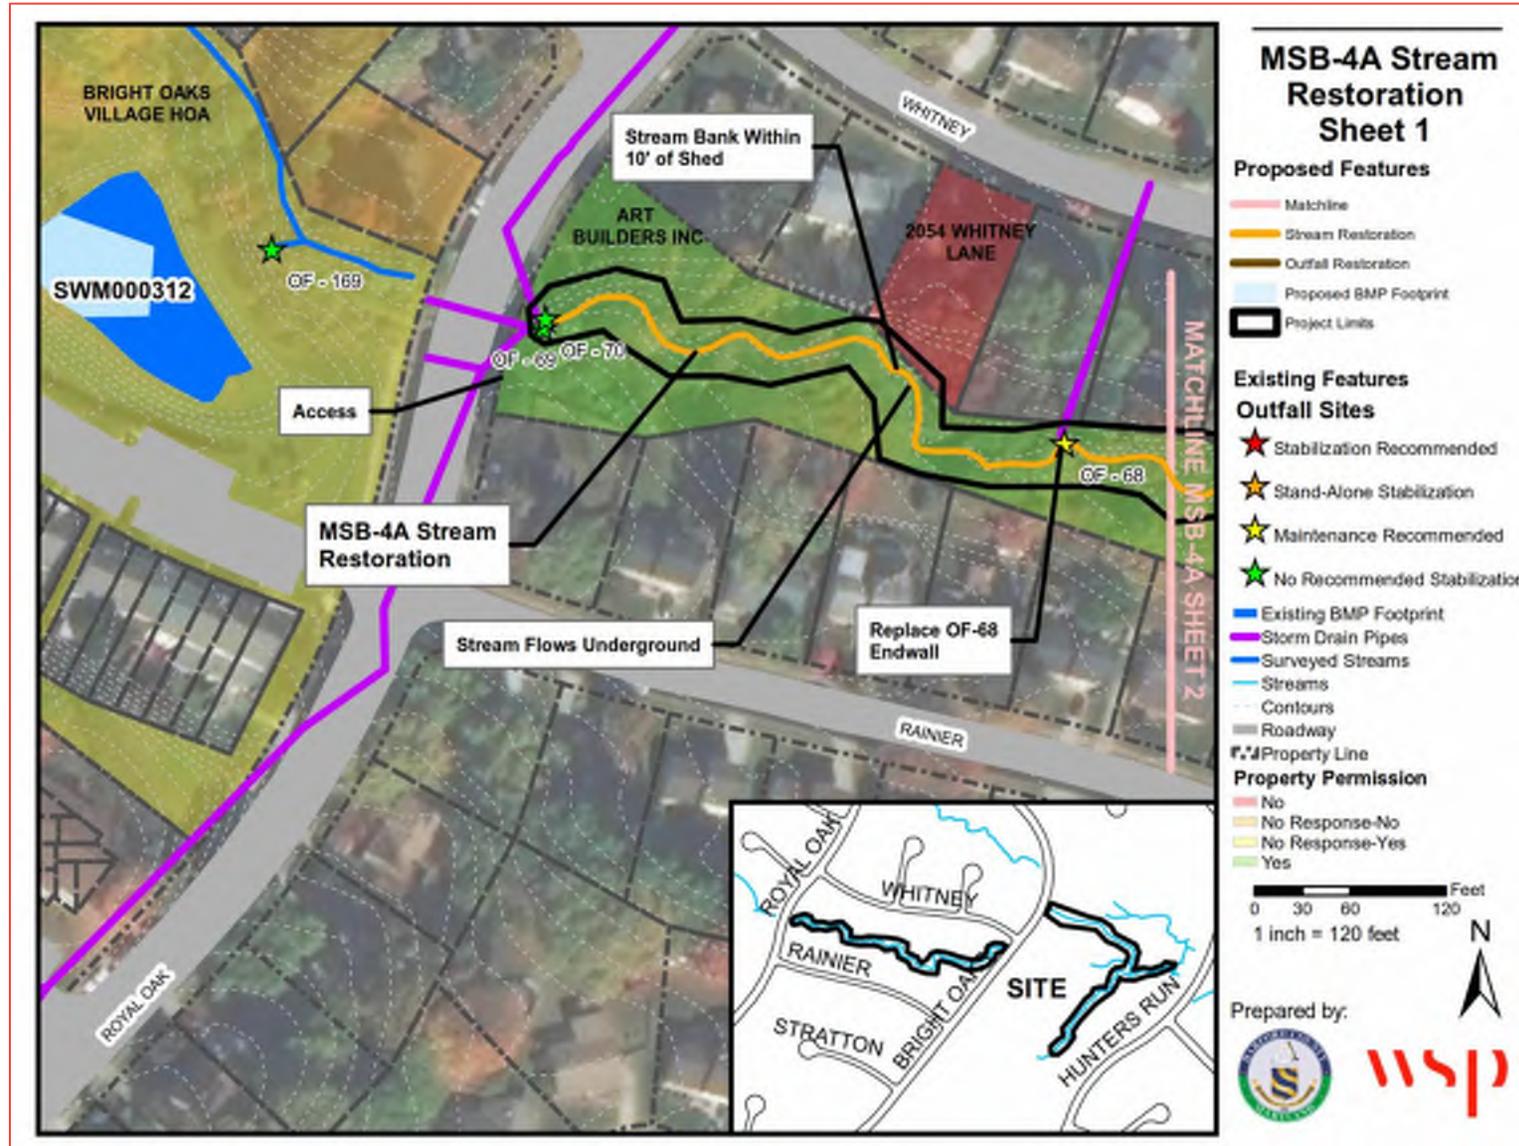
Site Location and Proposed Project Plan for MSB-4A Stream Restoration (Sheet 1 of 3)
